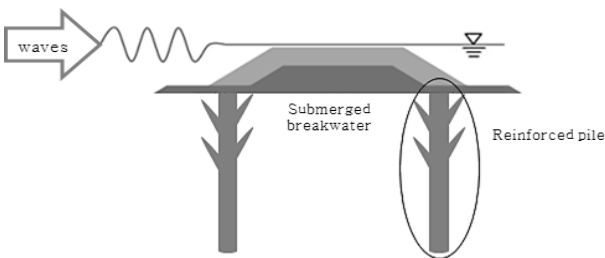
Concept of Submerged Breakwater and Reinforced Pile
